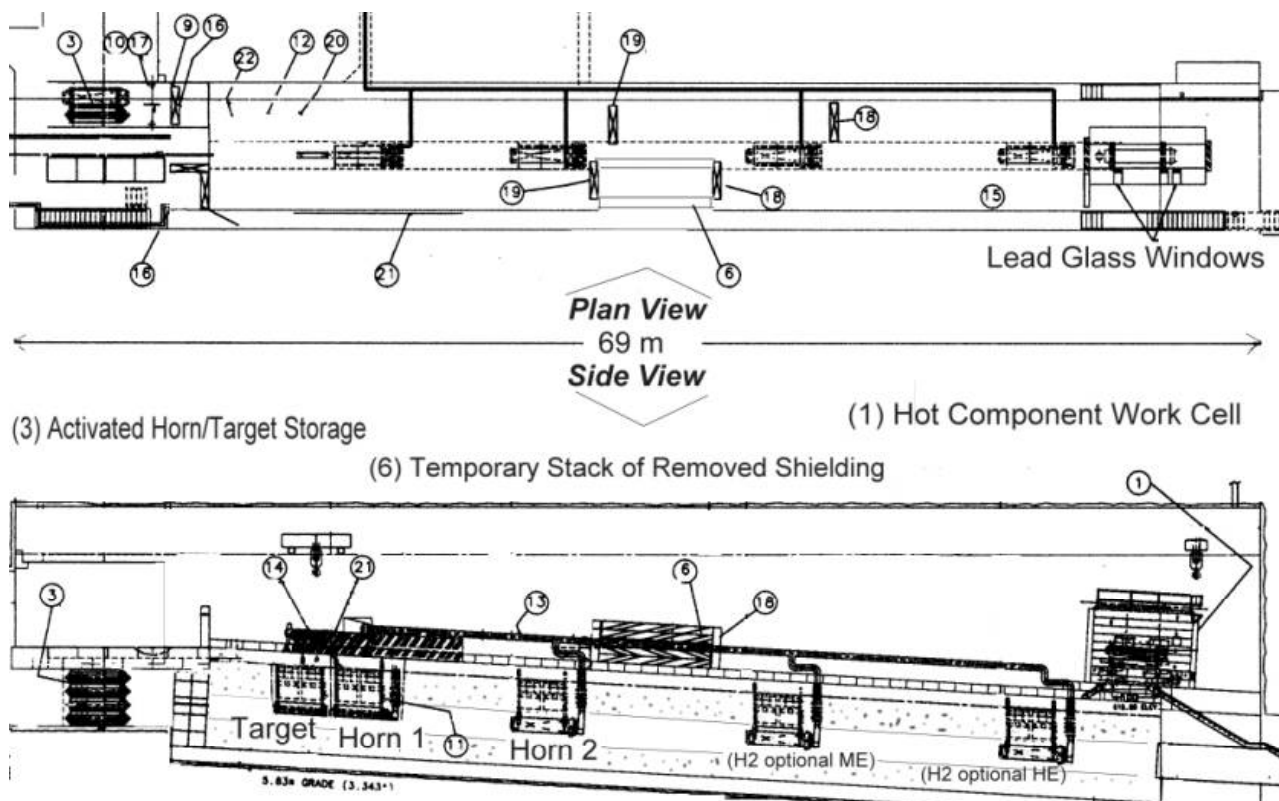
Plan and elevation views of the NuMI target hall.
